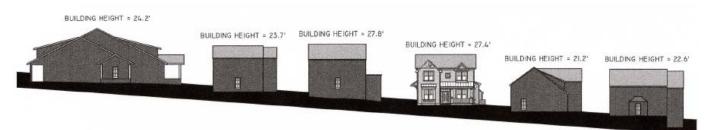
Rendering of proposed dwelling to compare massing with nearby existing dwellings as from Virginia Avenue
